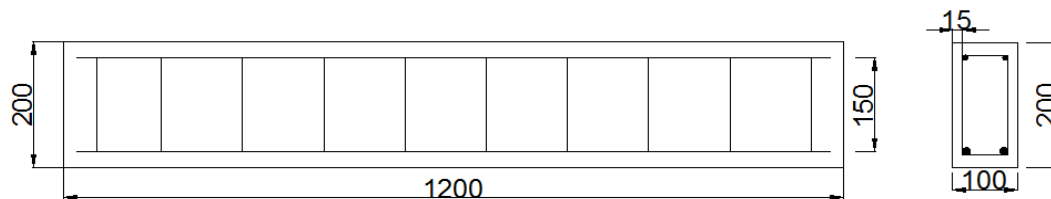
Geometry of beam specimen (All dimensions are in mm)
